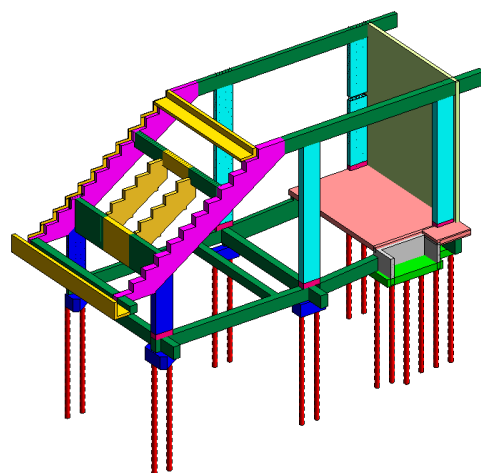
A part of the stadium project where there are many type of great beams, angle beams, stair beams joining in a zone for execution in place. (Precast and cast in place)
